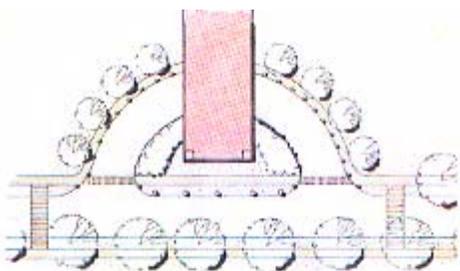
Recommended hotel drop-off site plan layout.
